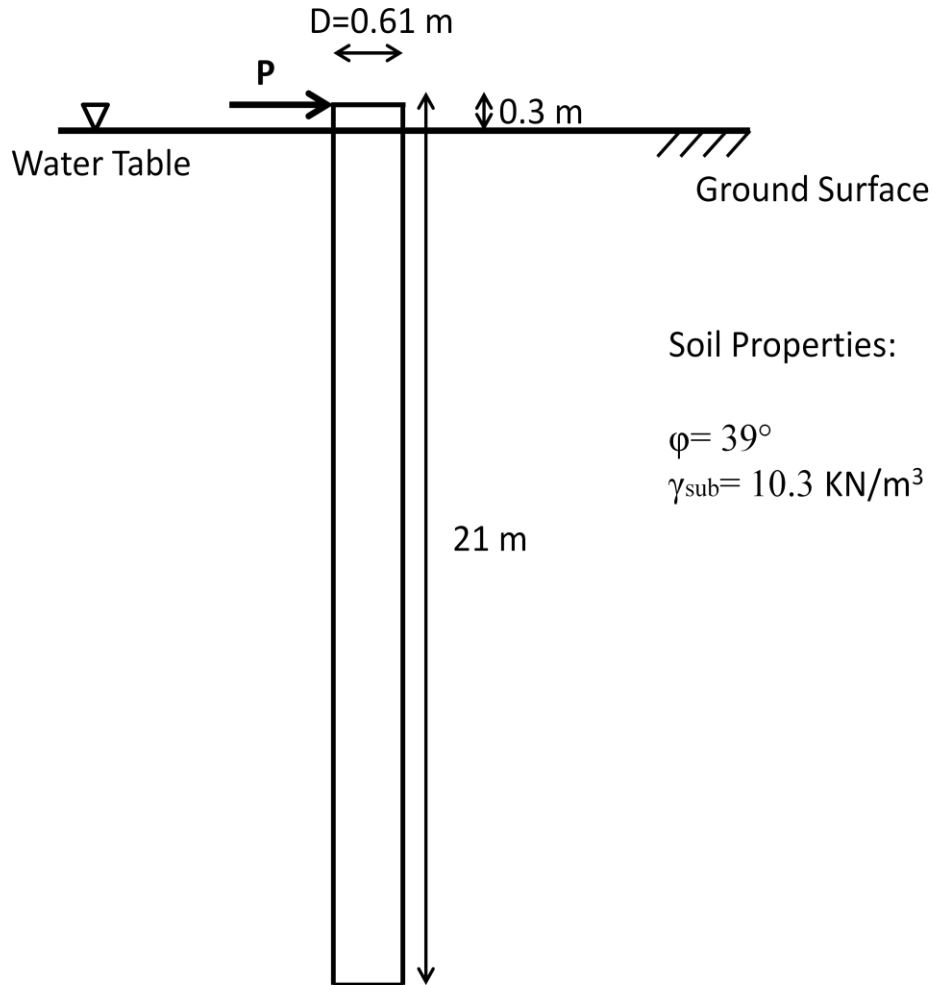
Cross sectional overview of the pile used at Mustang Island
